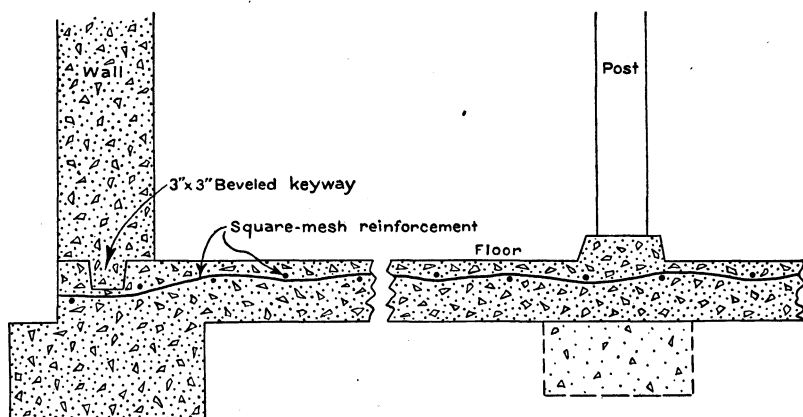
Water-tight construction: Reinforced concrete floor with beveled keyway interlocking wall and floor
